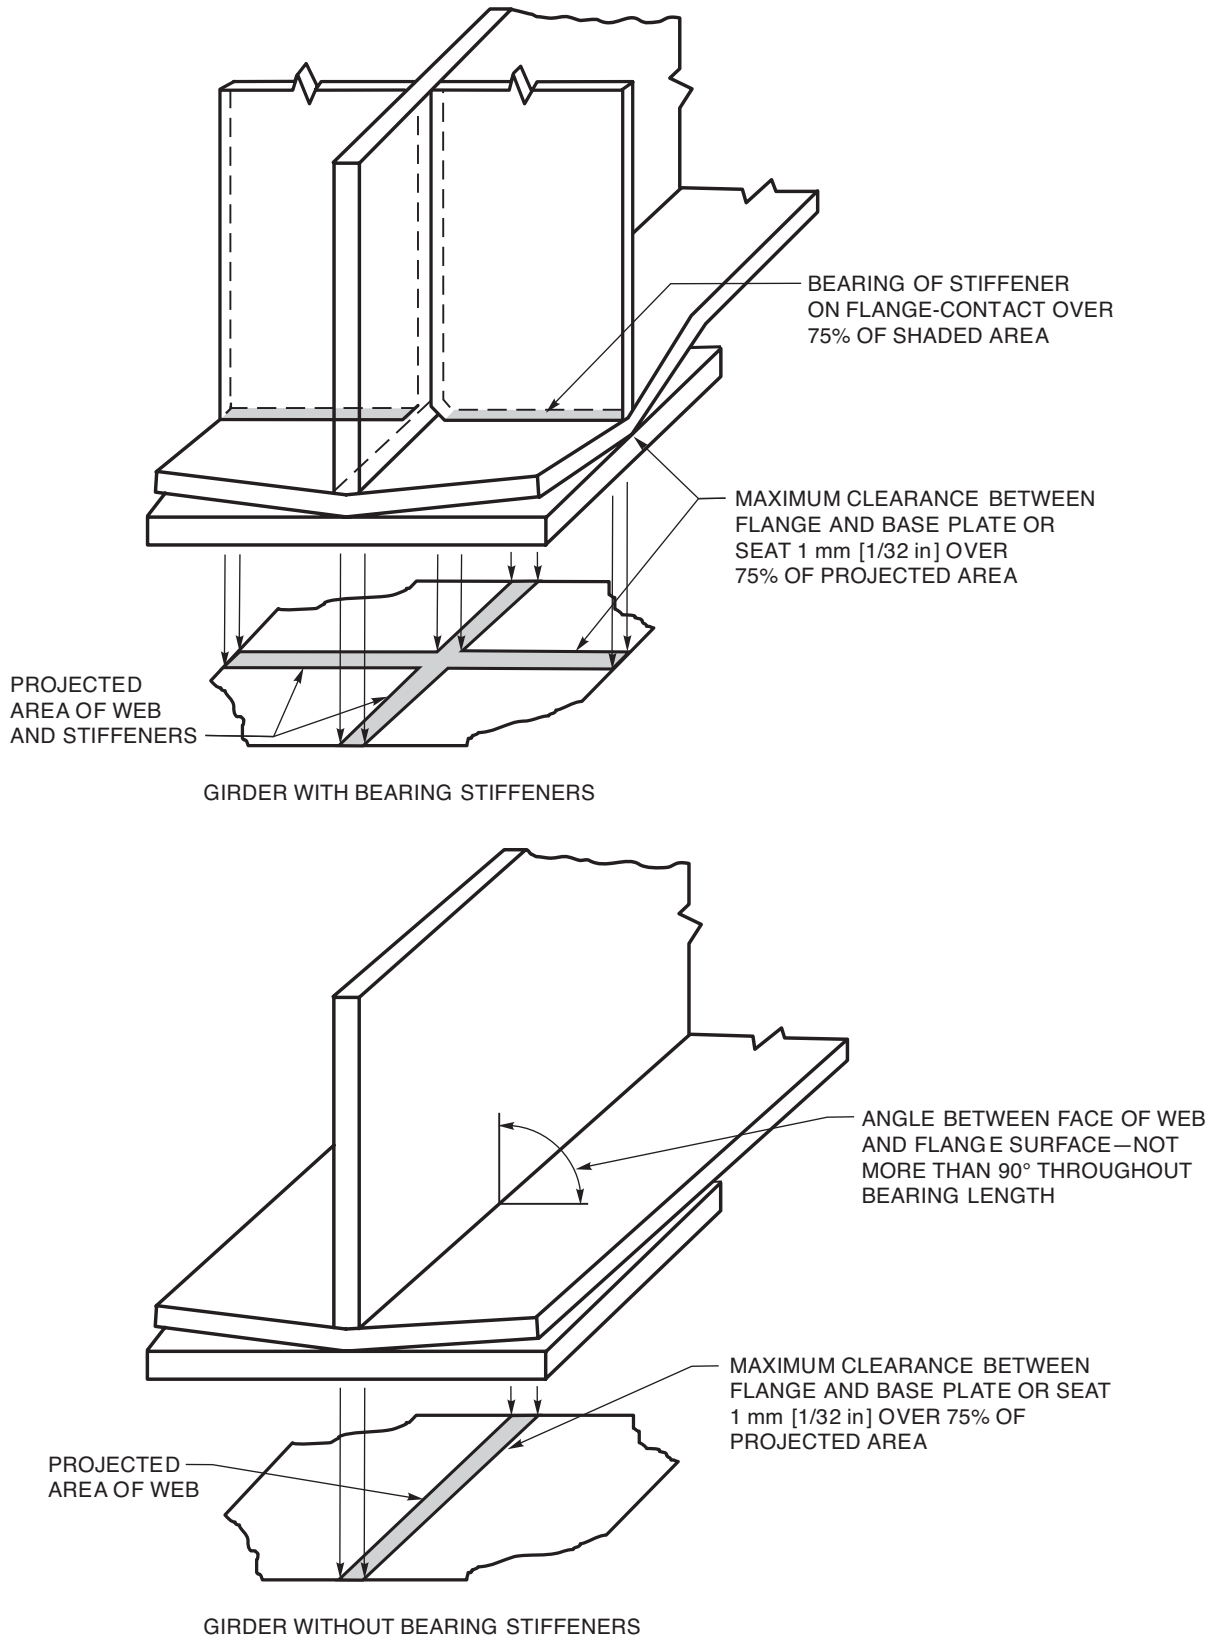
Tolerances Bearing Points (see C-5.5.9)
